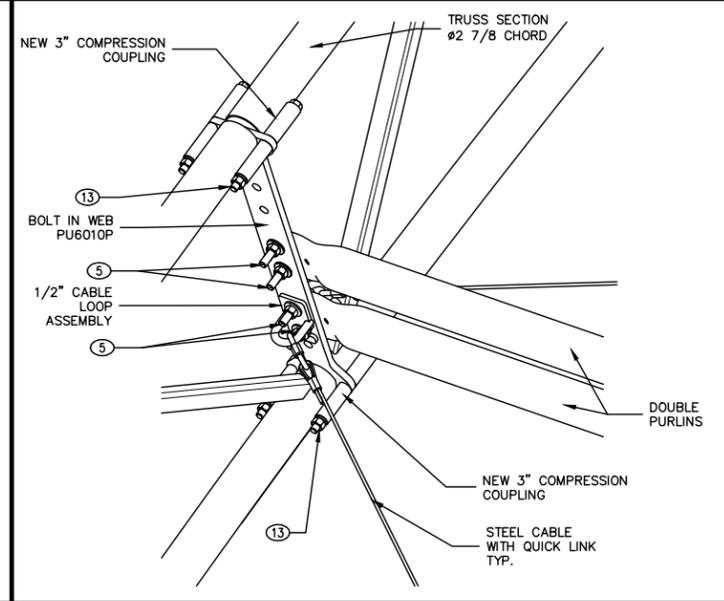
RIDGE PURLIN AT END AT WELD IN WEB
